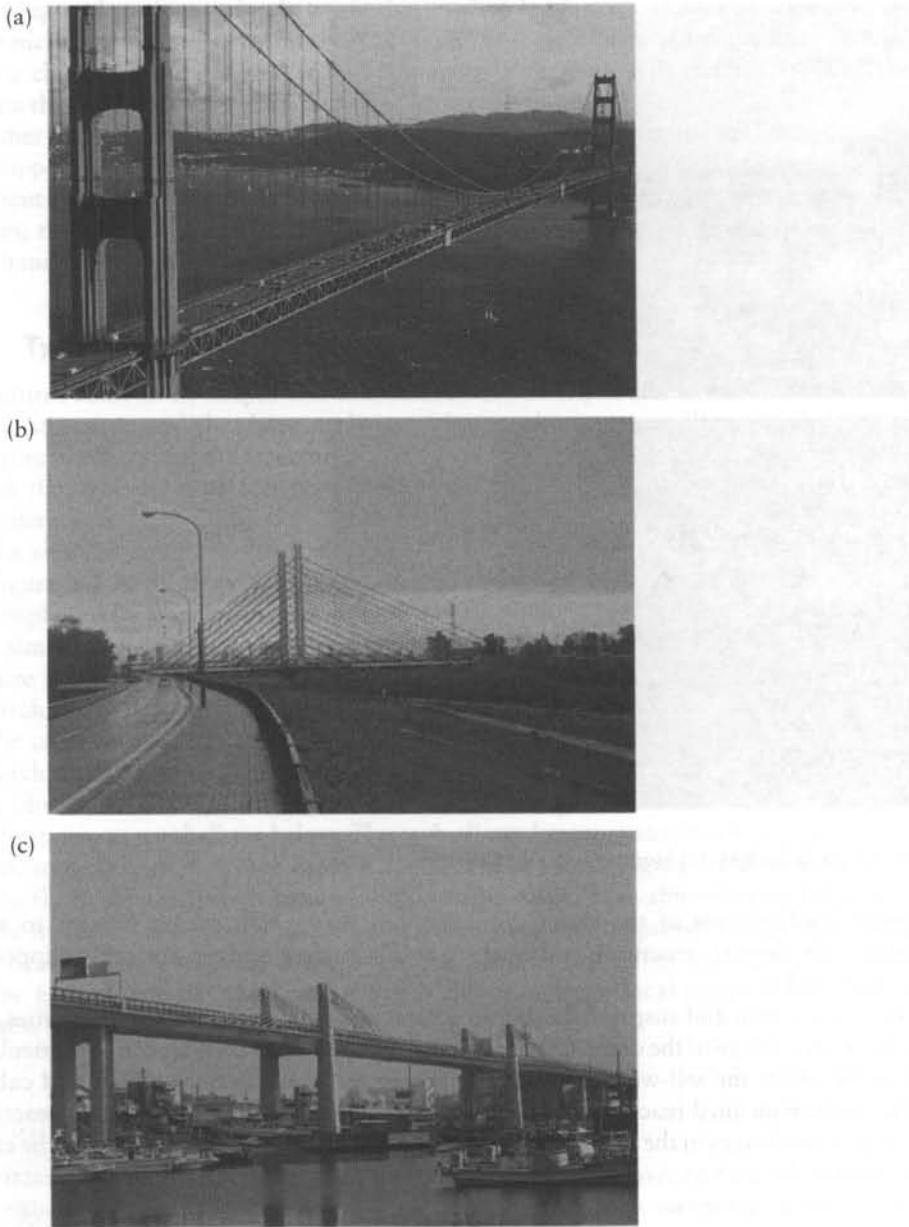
Use of cables. (a) Suspension bridge. (b) and (c) Two types of cable-stayed bridges.
